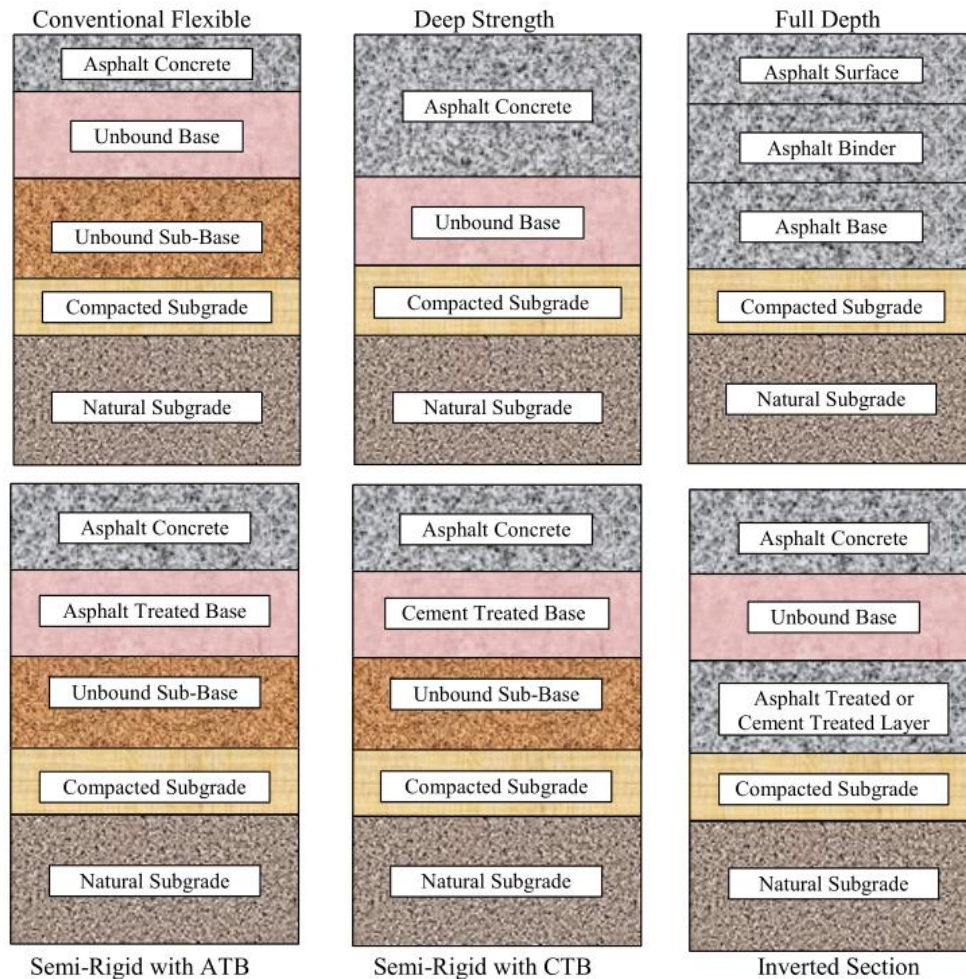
Common flexible pavement profiles (adapted from NCHRP 1-37A Design Guide, 2002).
